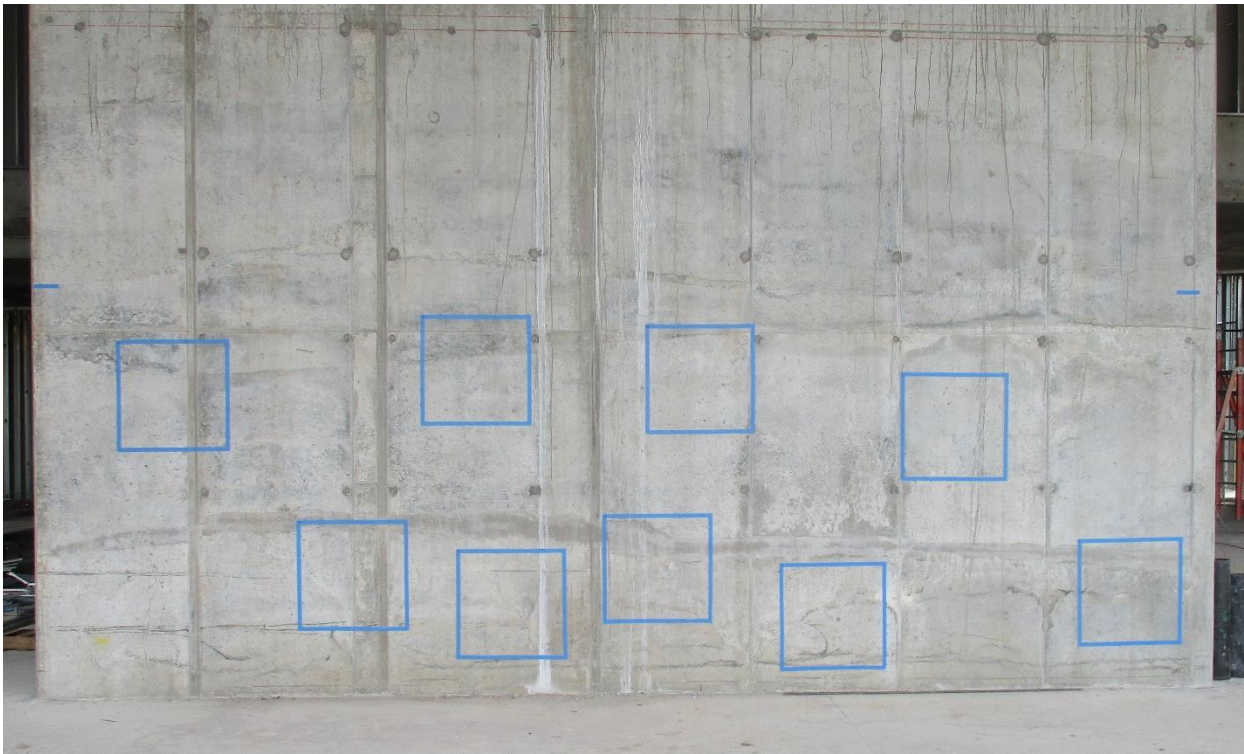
Randomly located samples determined by Lab C for shear wall
